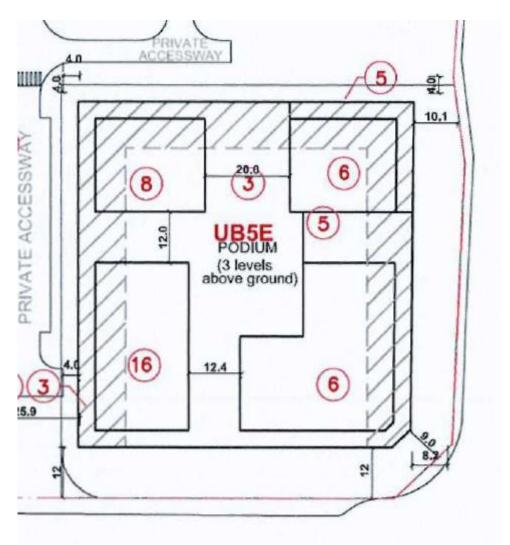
Approved Stage 1 Building Separation DWG No. A007
